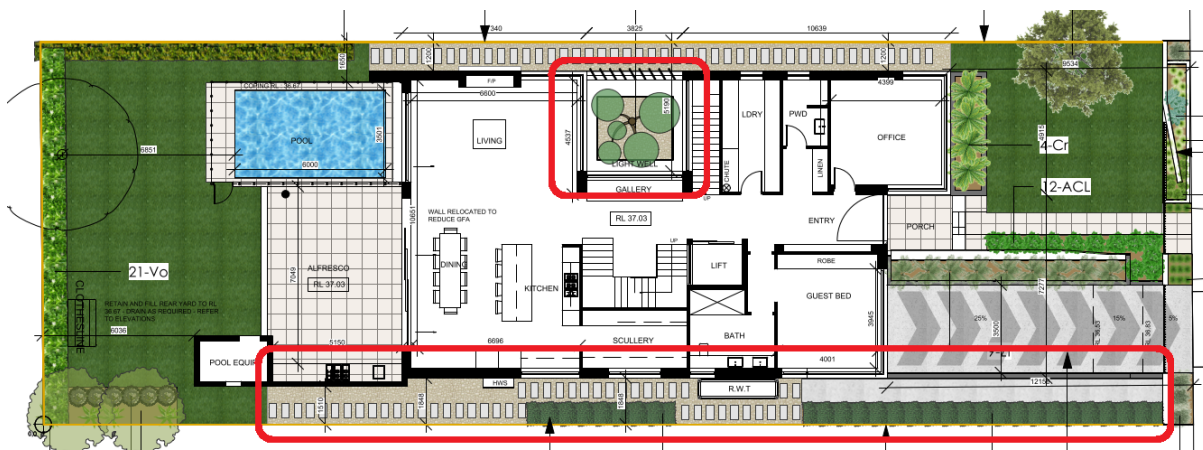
Extract of the landscape plan (source: Dapple Designs, LP 01 sheet 1 of 3, dated 03/02/2021).
